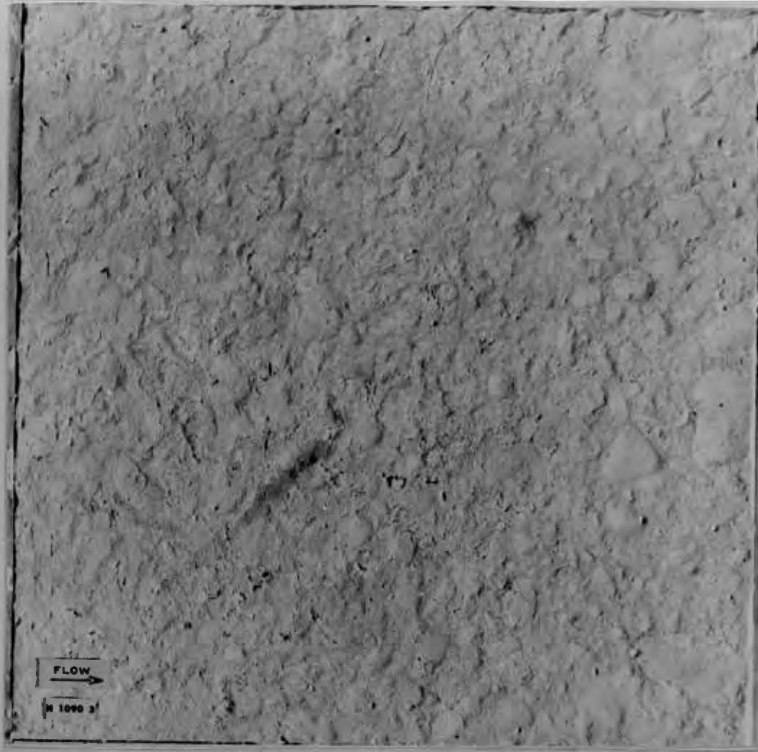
1-foot-square plaster mold of eroded surface at Davis Dam (Specimen No. 3).
